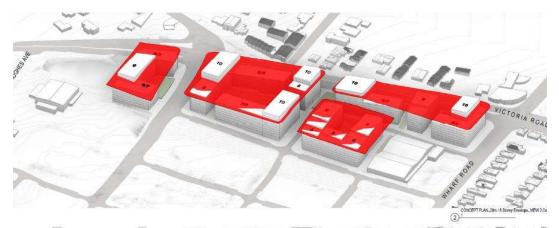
Concept Plan MOD A -PLEP building height (shown in red) & building above LEP in white (Source: Council)
